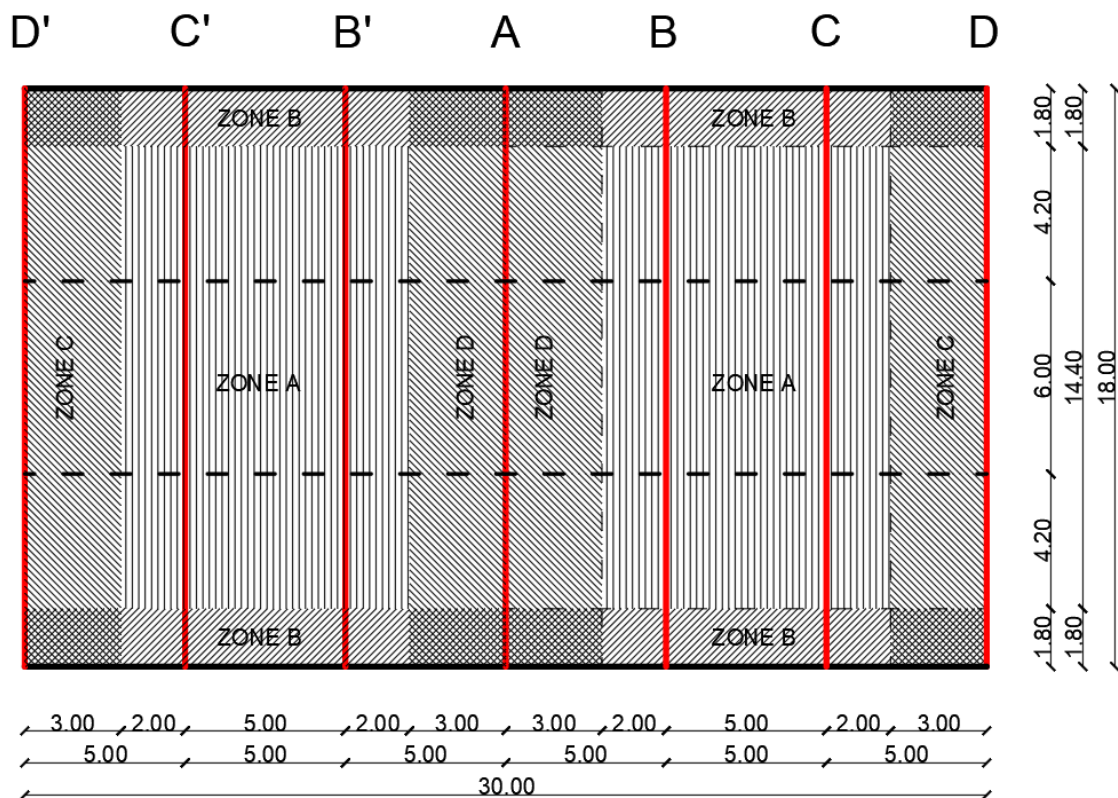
Pressure Zones on the Roof of the Pavilion. The red lines depict the beams on the roof.
